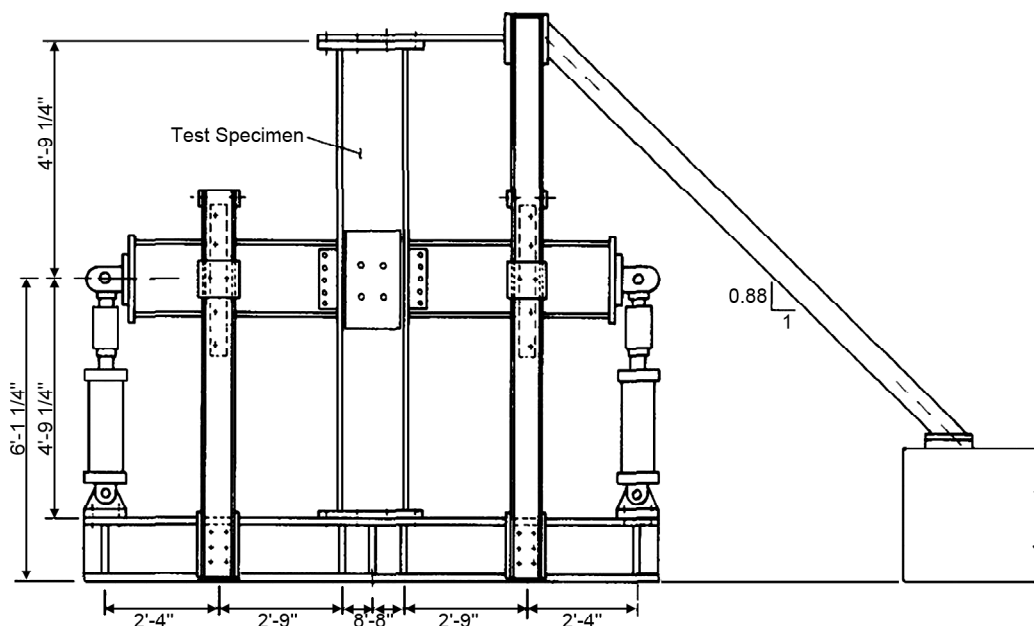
Test fixture for mounting specimen (Bertero et al., 1973).
